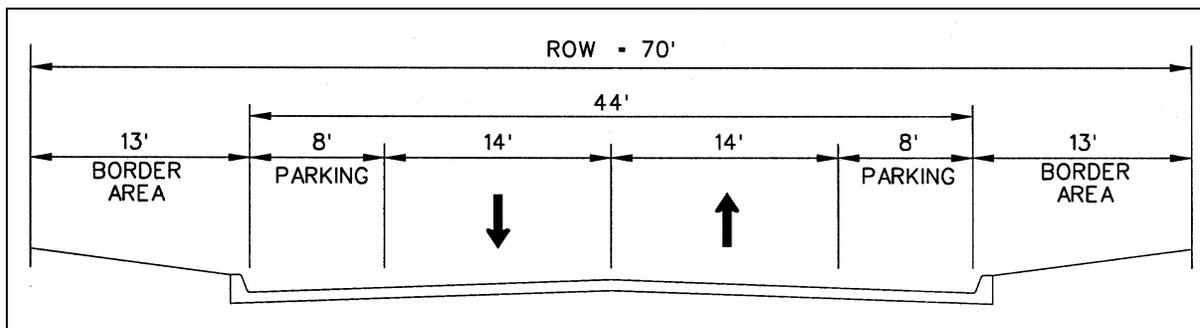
Typical Roadway Sections for Collectors – Alternative 2.
